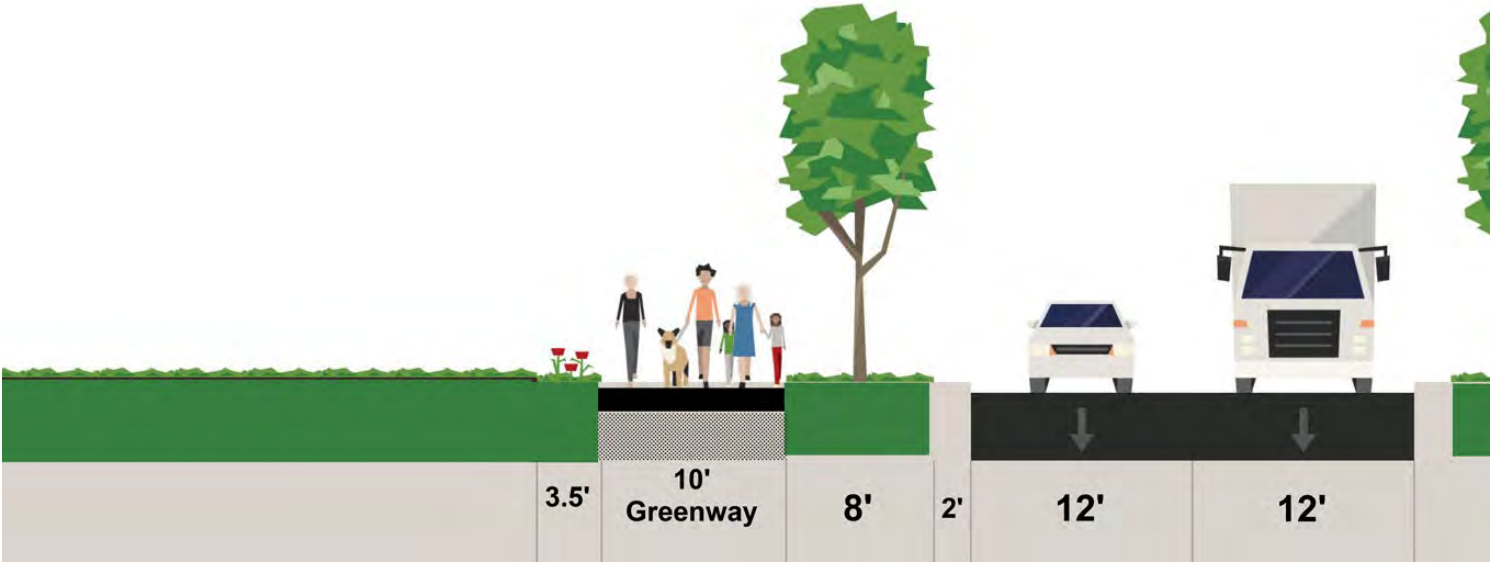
Cross Section: Branchview Dr. –Lawndale Ave to Union Street
